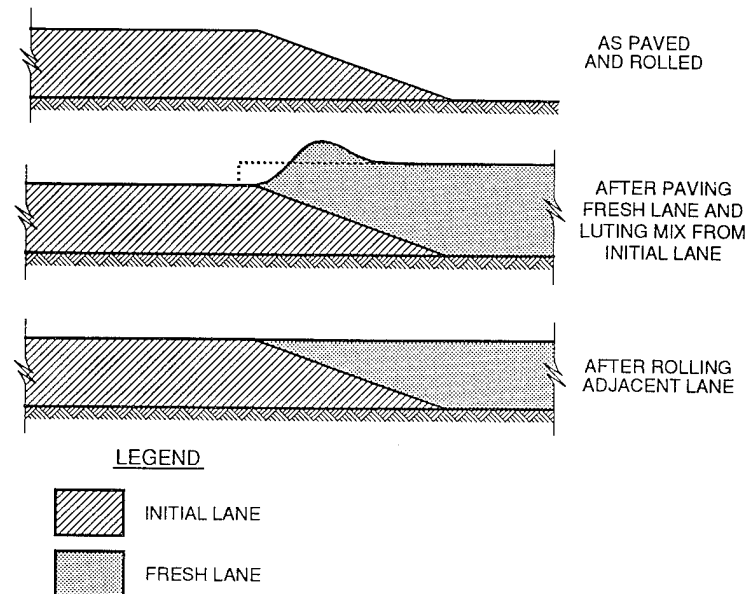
LONGITUDINAL WEDGE JOINT CONSTRUCTION
